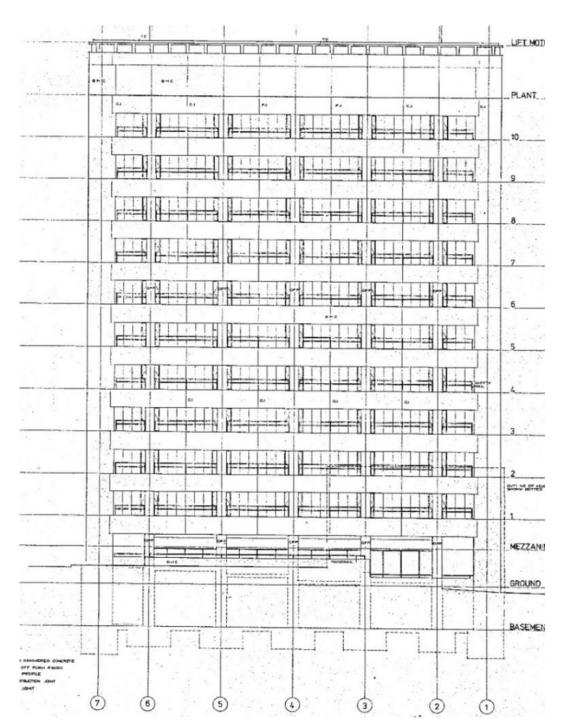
Architectural drawing of the north elevation, dated 1975 (BAP).
